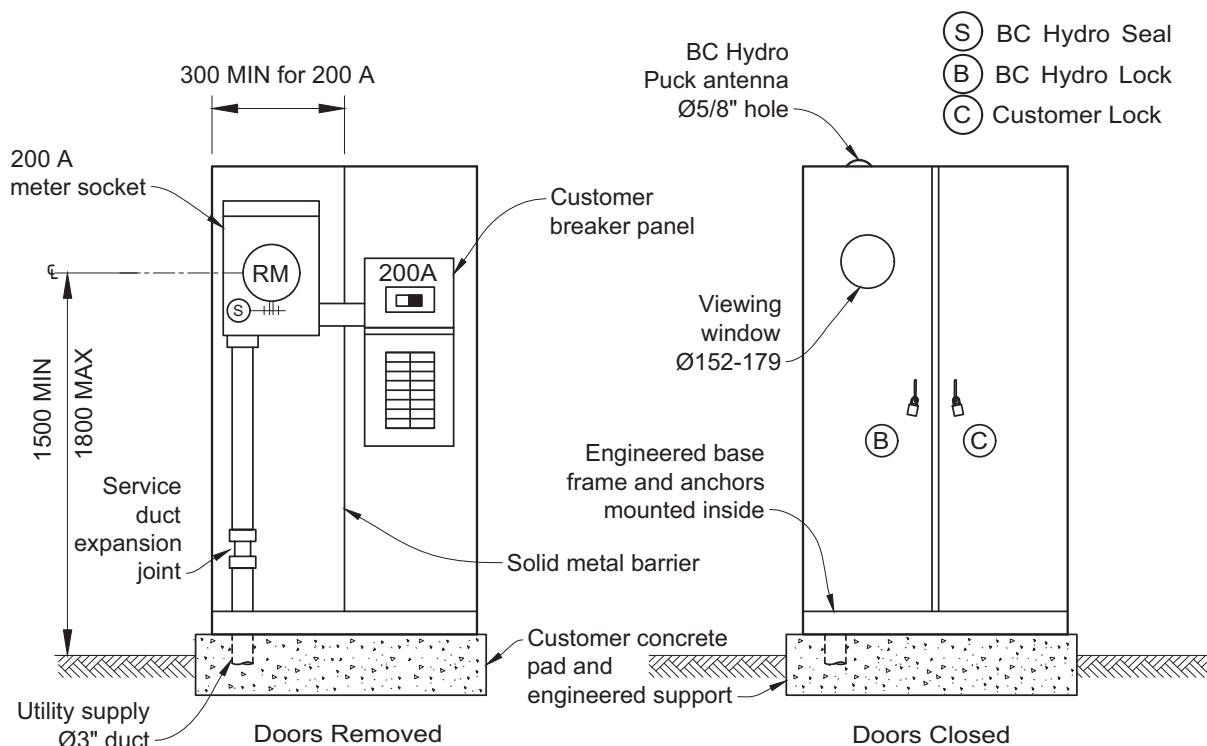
Kiosk with revenue meter socket mounted inside enclosure
